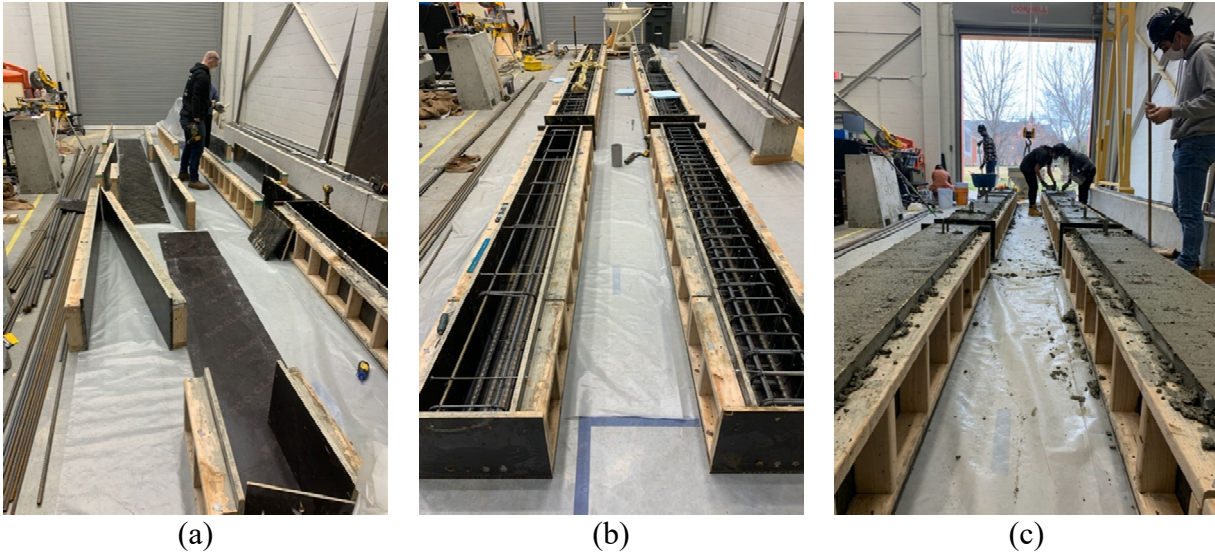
(a) Formwork assembly; (b) completed rebar cages in formwork; and (c) just after placing the concrete.
